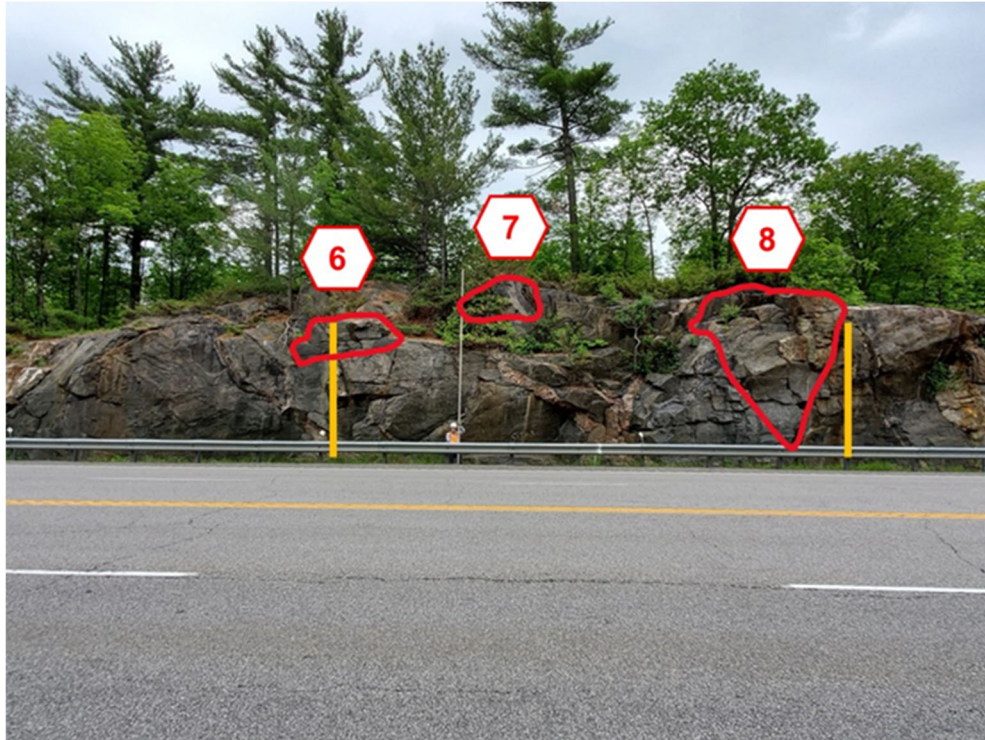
Existing Rock Cut Site 17-2, near 12+750 Right (2020/06/09)
